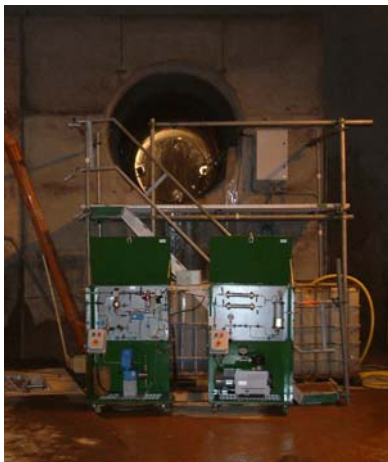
Short low-pH shotcrete plug test at Äspö URL (Sweden)
